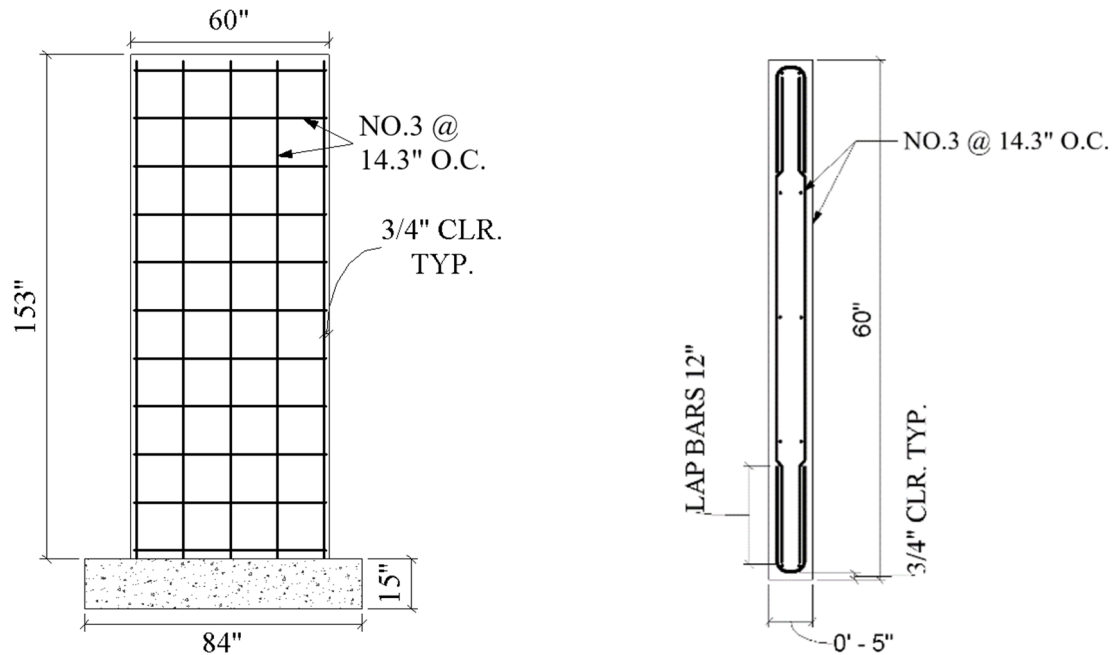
Final Half-Scale Wall Specimen Dimensions and Rebar Layout
